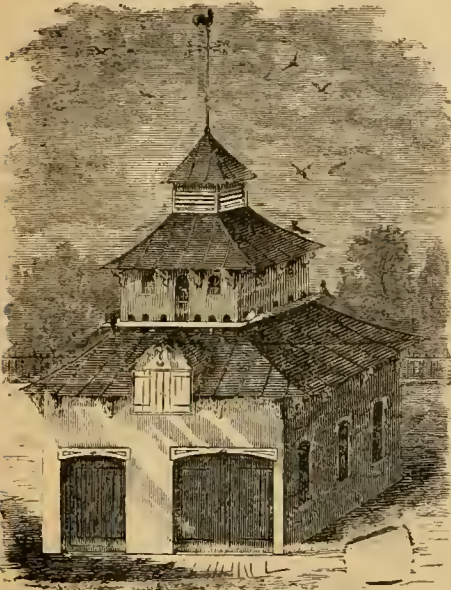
CARRIAGE AND PIGEON HOUSE.
